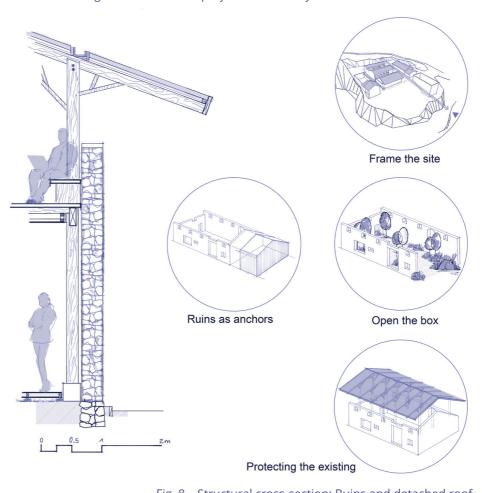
Structural cross-section: Ruins and detached roof (left); Architectural concepts (bubbles on right).
